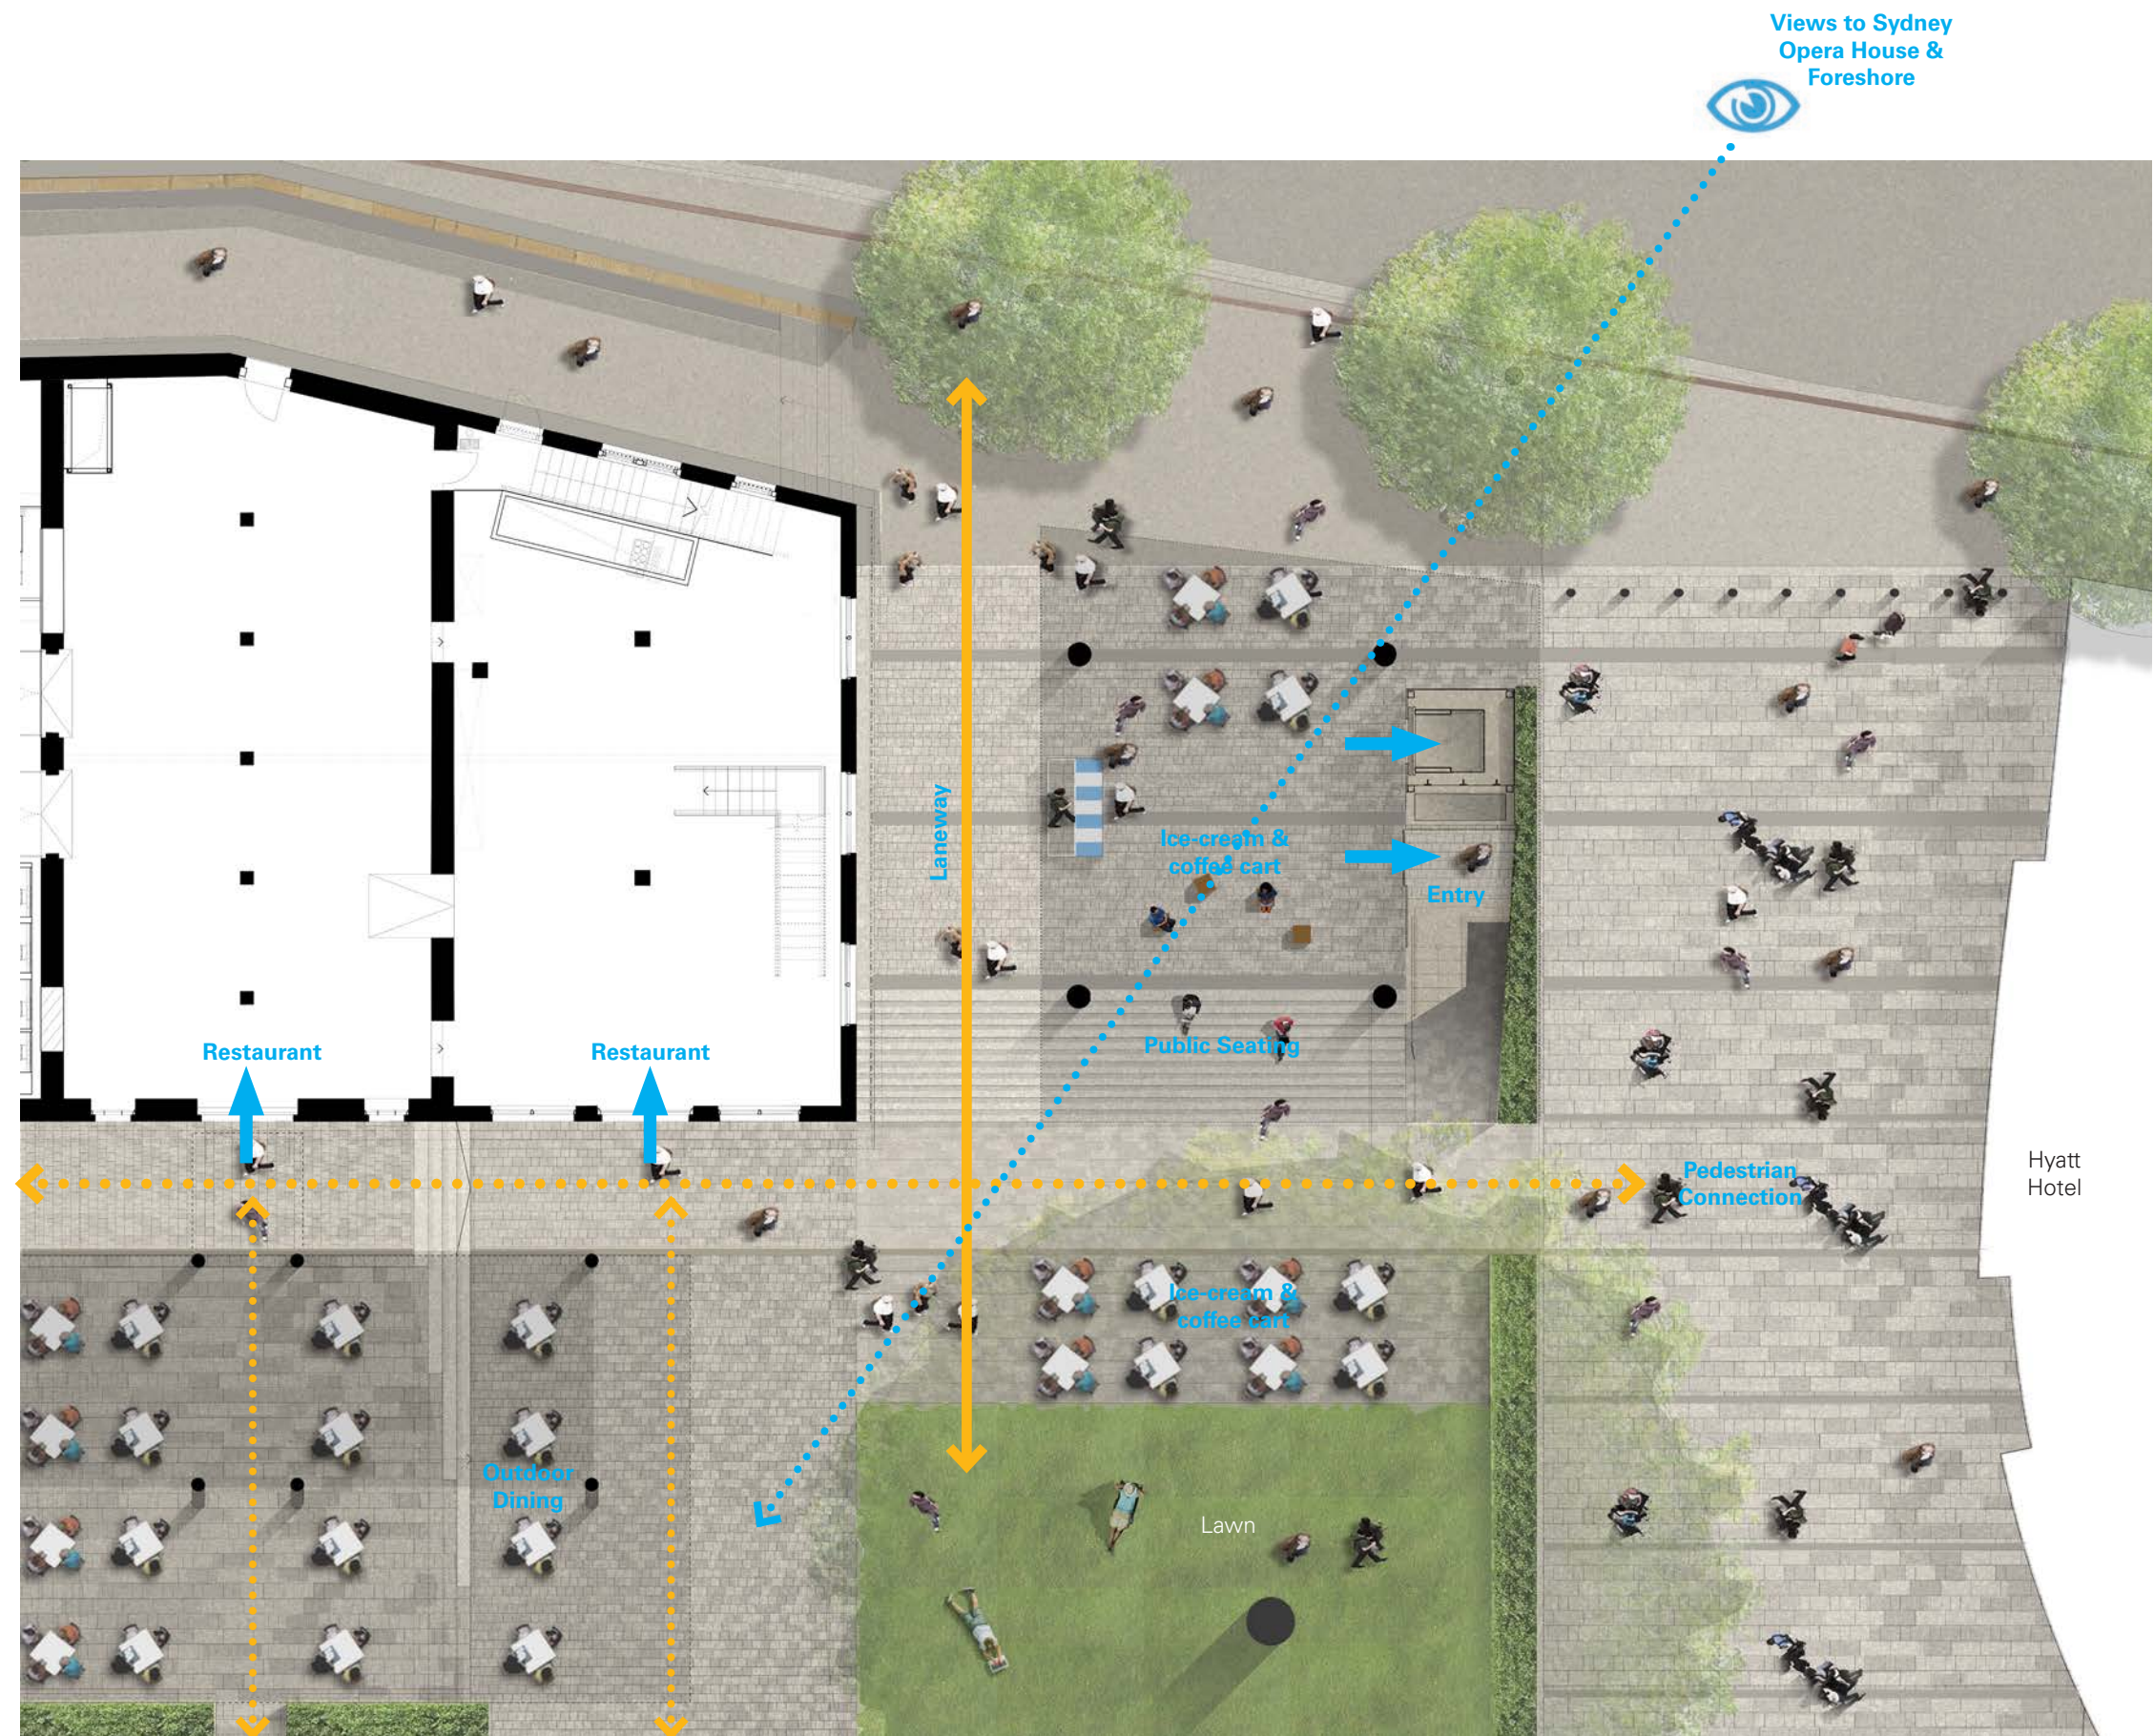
Rendered Ground plan (NTS) describing the Bay 12 public domain as it connects to future works by SHFA.
